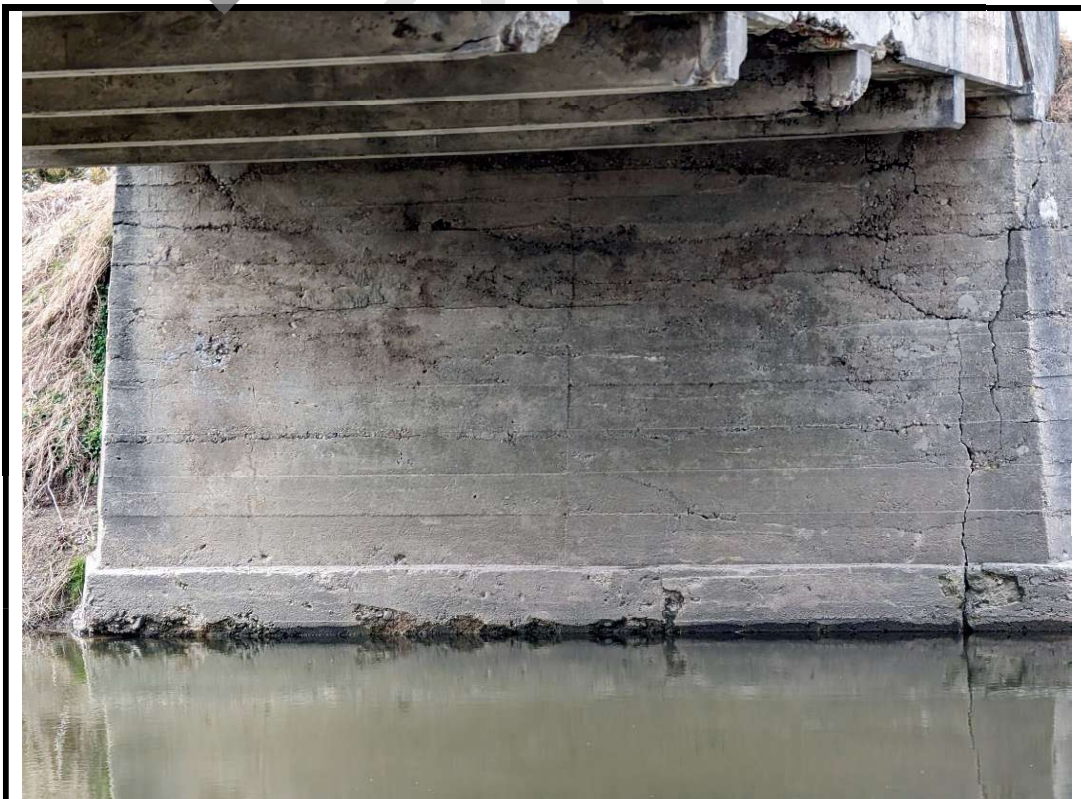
Erosion and wide cracks noted at north abutment.
